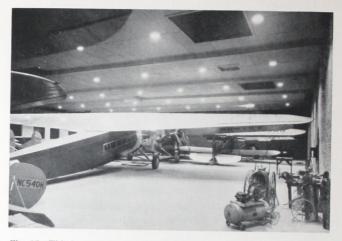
This large hangar is lighted by fifty-six 200-watt prismatic glass units mounted flush with the ceiling and spaced on 14×18 foot centers.
